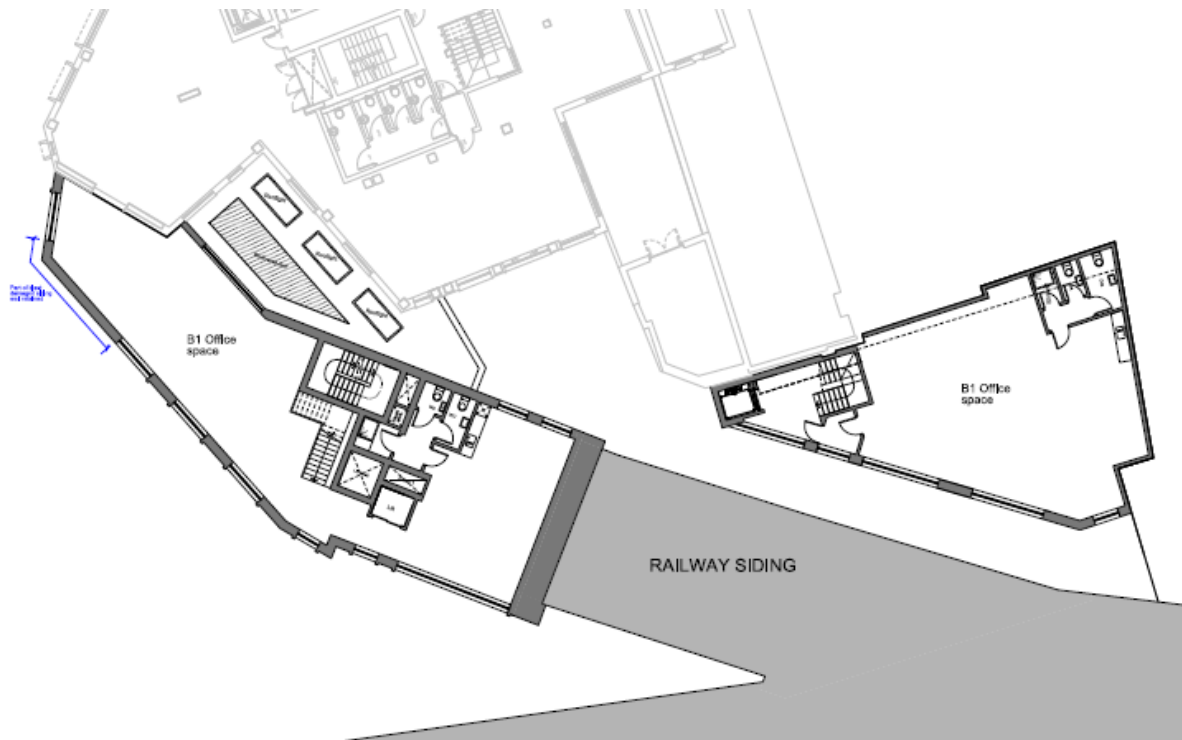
Figure C: View of the existing railway siding (right) and 99 Mansell Street and 31-33 Prescott Street development (left)
